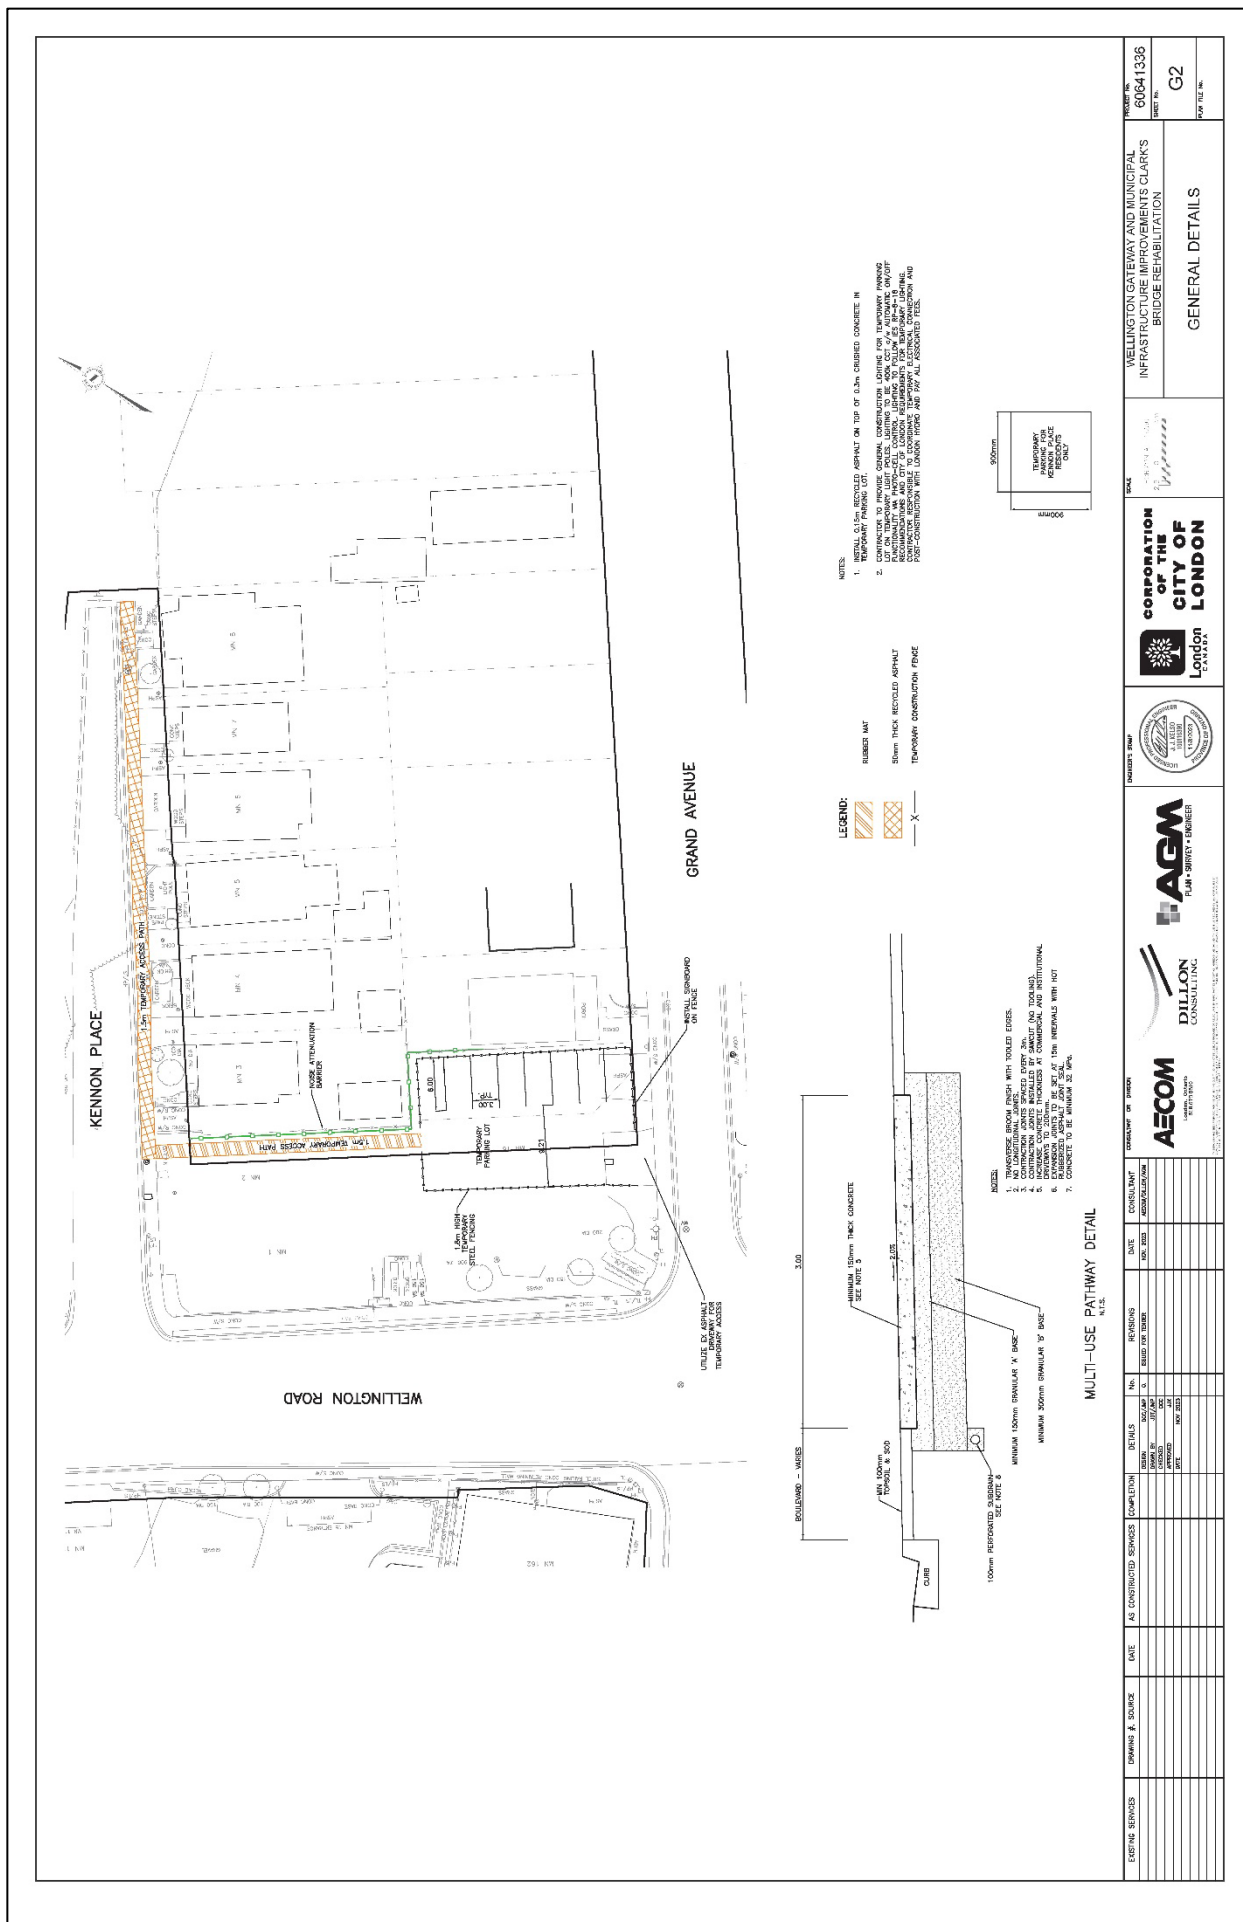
Wellington Gateway Construction Project Detail Design Drawings (AECOM, Dillon Consulting, AGM, dated November 2023).
